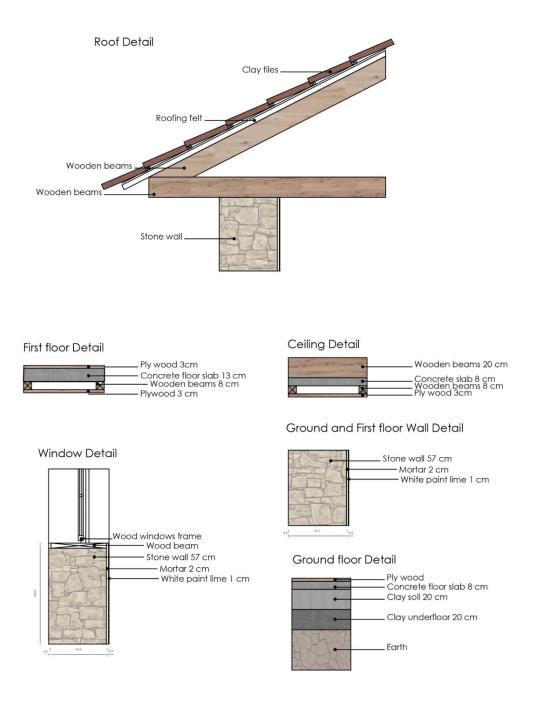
Beqiri, A. (2024) Andromaqi Melko House Construction Details
